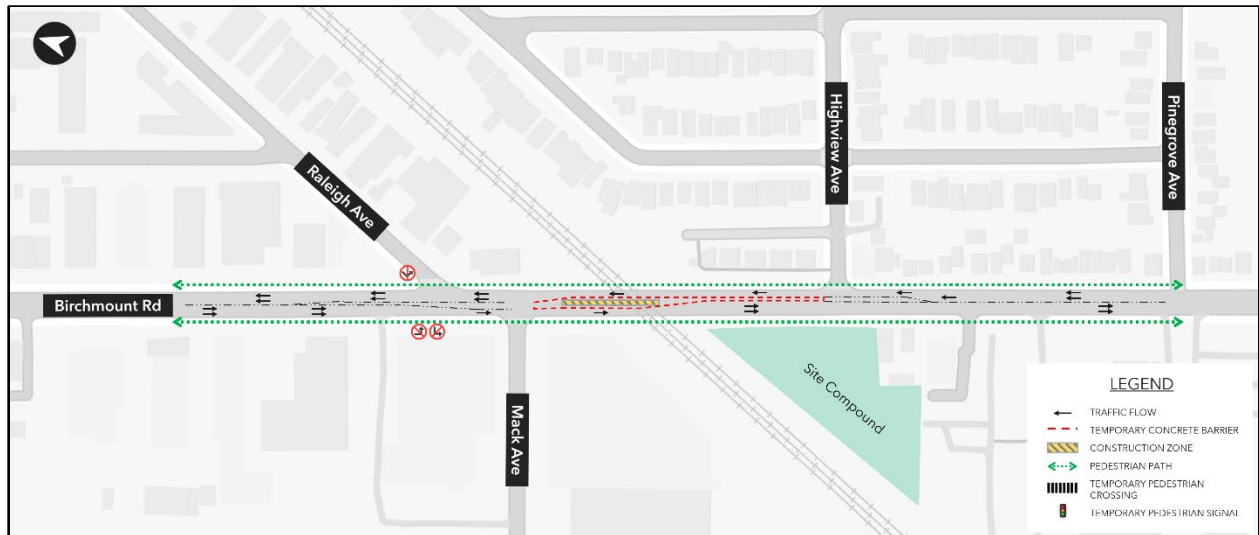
Birchmount Road Bridge – Final Bridge Completion
